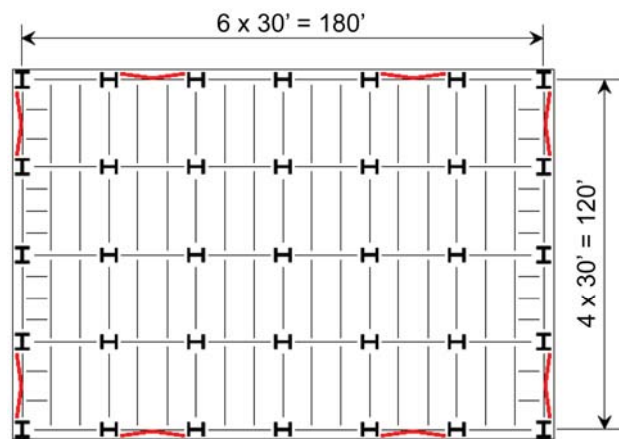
Plan configuration of 12-story and 16-story braced frame archetypes.
